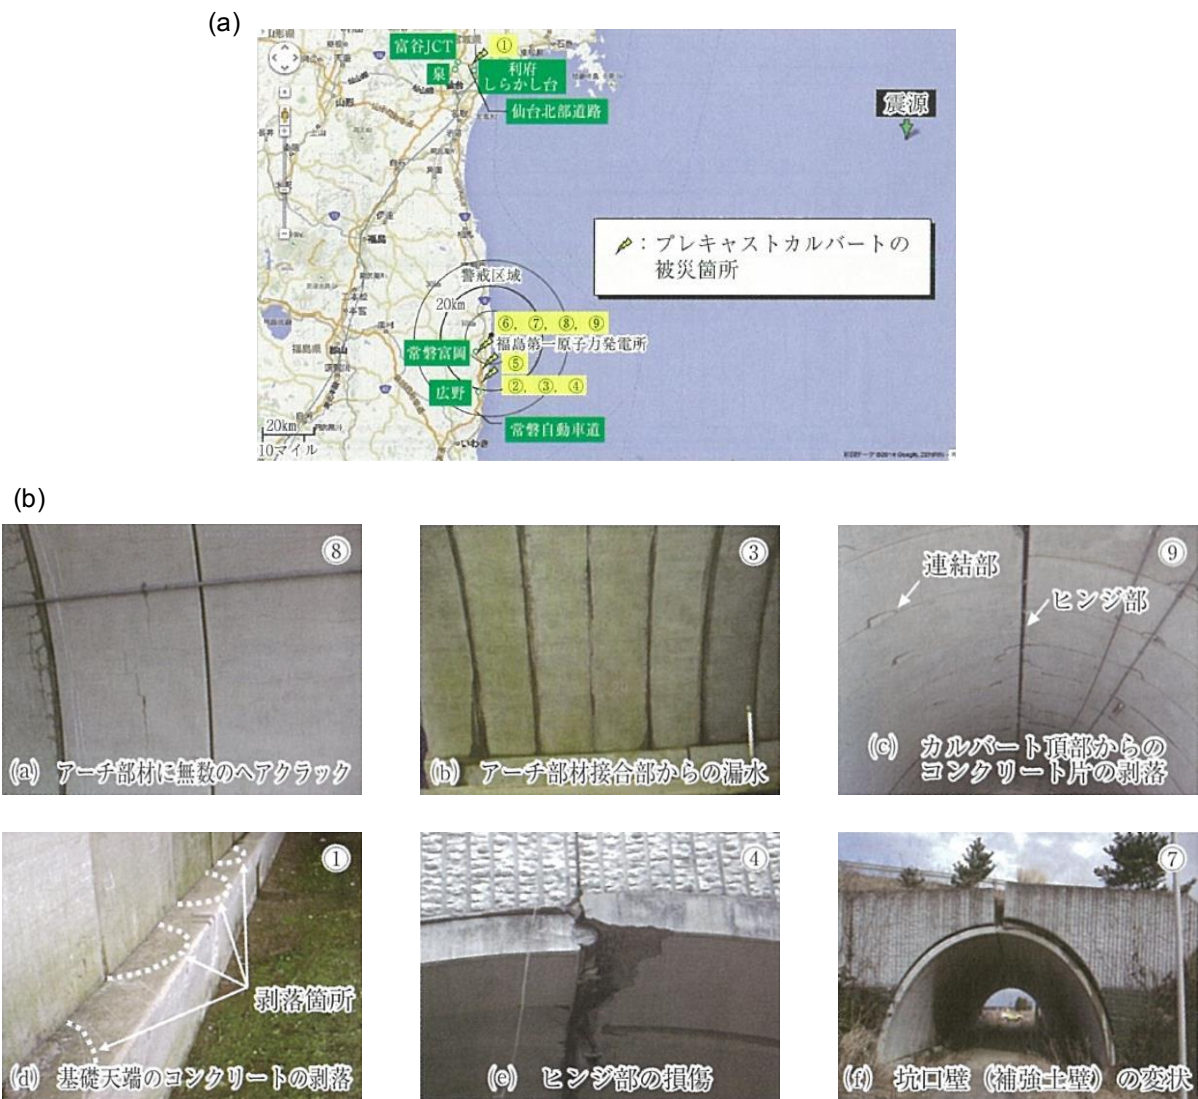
Damage to three-hinged arch culvert due to Great East Japan Earthquake (cited from report by Abe and Nakamura, 2014): (a) locations of damaged culverts and (b) states of damage.
